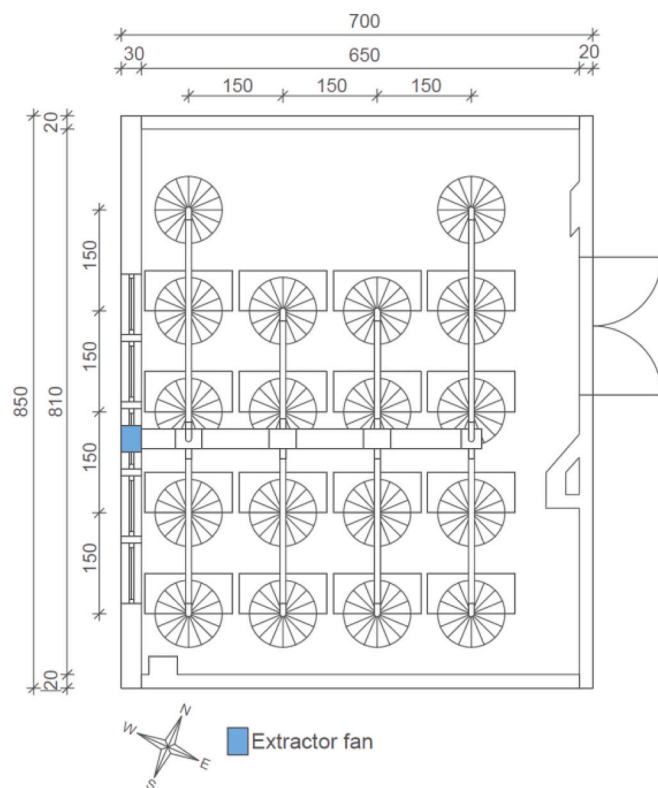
Floor plan of the seminar room showing the layout of the MPIC-MEV system.
